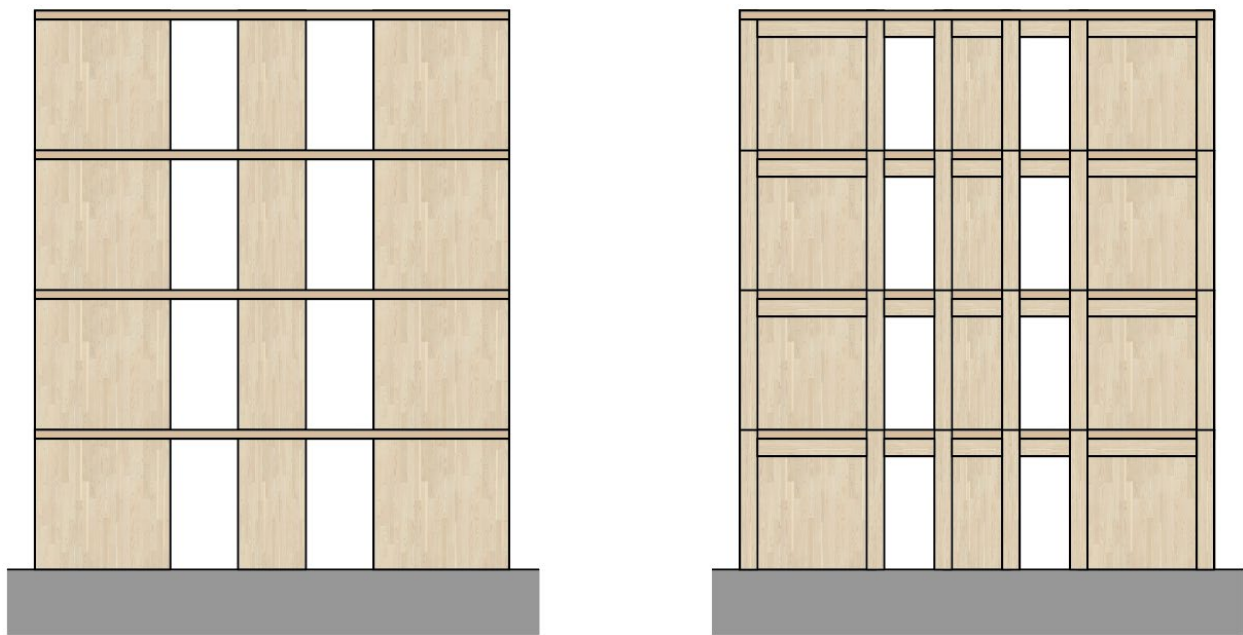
Shear wall (left) vs shear-frame (right) structural systems
